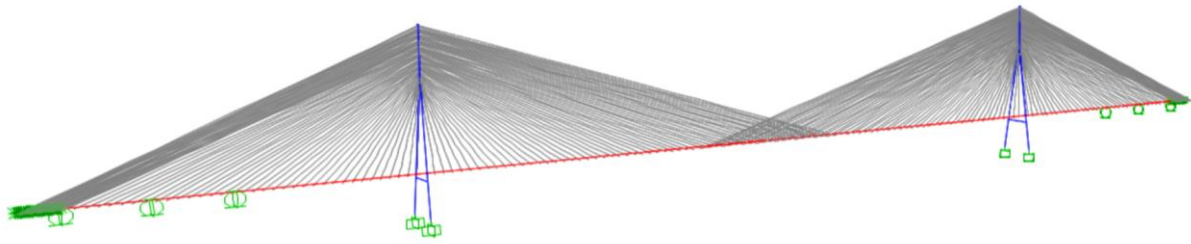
Three-dimensional finite element model of the bridge developed in SAP2000.
